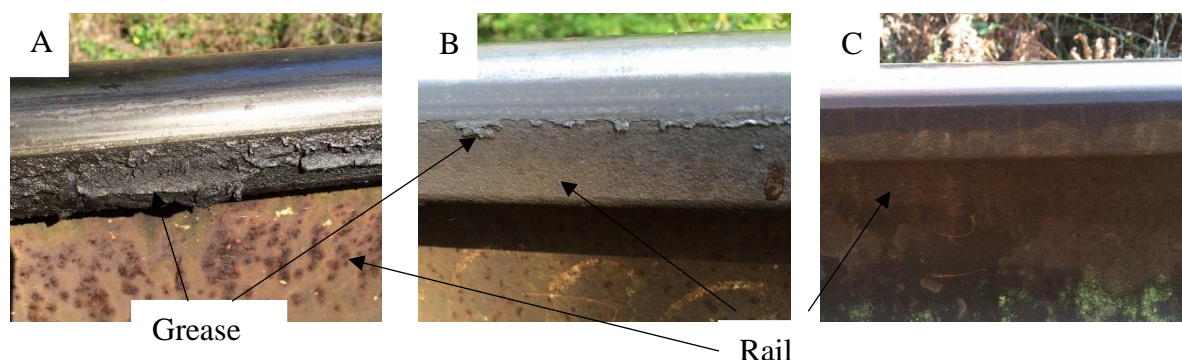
Gauge face view of rail for A) site 1 B) site 2 C) site 3
